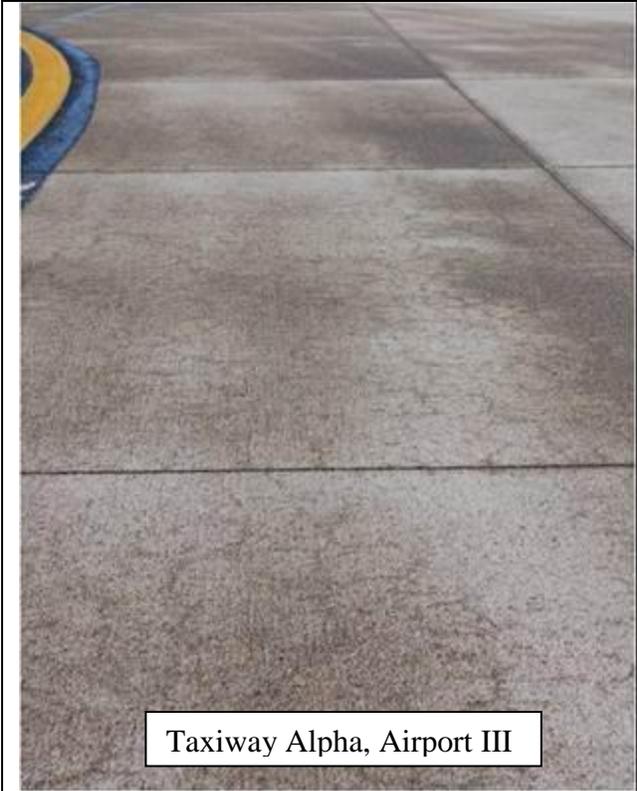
shows a typical layout of pavements at an airfield and coring locations in those pavements. Figure 4 shows photographs of typical locations in pavements from where cores were obtained. Where possible, multiple cores representing concrete from the same pavement with varying degree of distress were obtained. The typical core size used in this investigation was 4 inch in diameter and full depth of the pavement, although in a few pavements the core diameter ranged from 3.75 inches to 5.75 inches.
